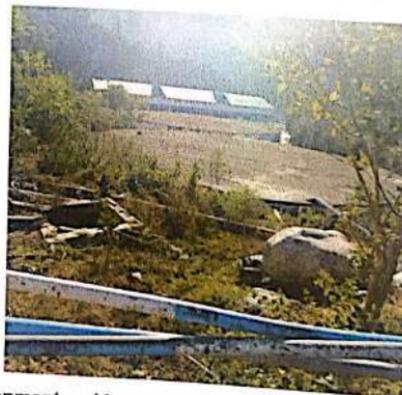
New Infrastructural Development and Improvement of existing Infrastructure
